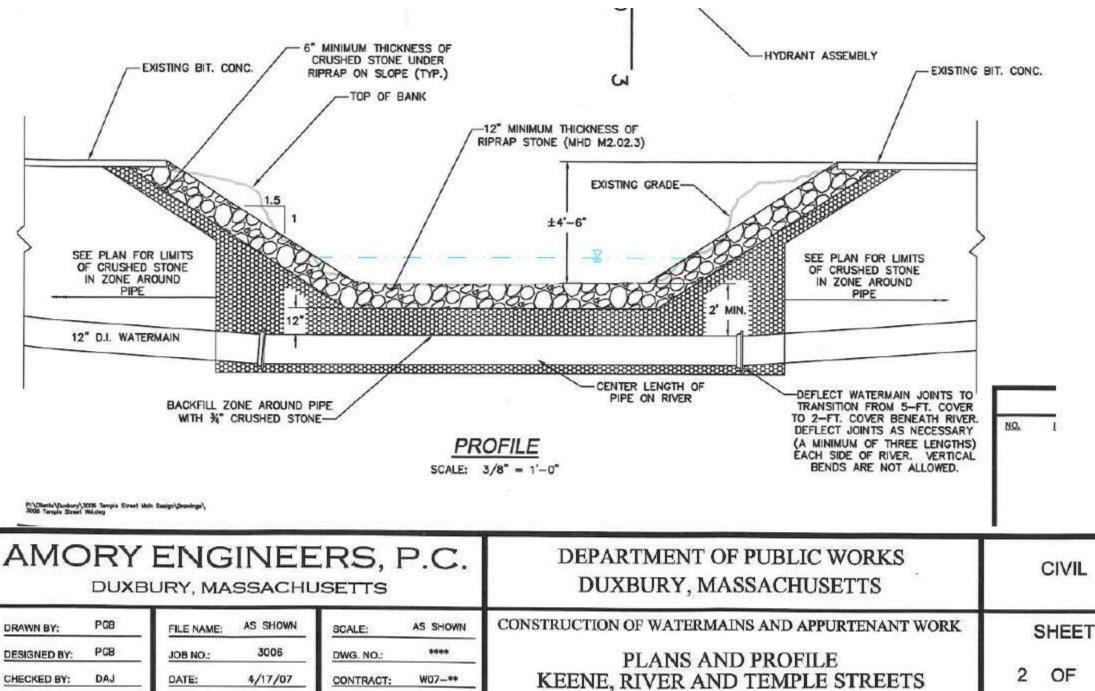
Water Line Plans from Amory Engineers (2007)
